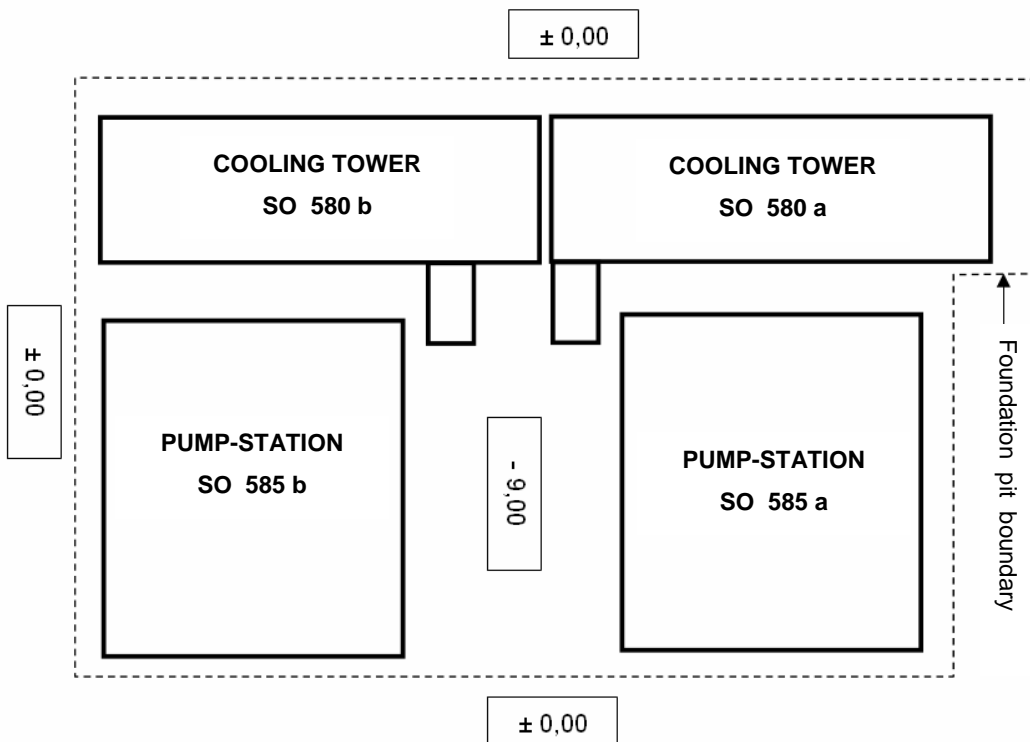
Section plan of pump-stations and cooling-towers in foundation pit
